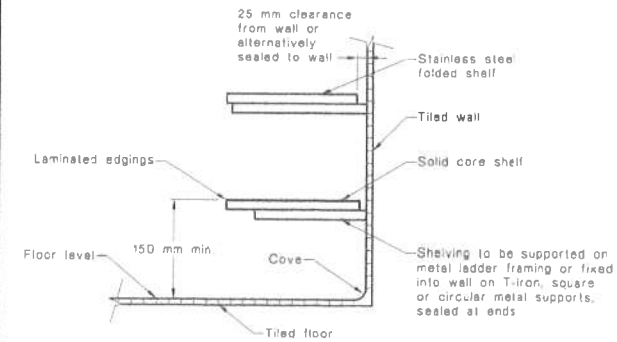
TYPICAL ARRANGEMENT—SHELVING
